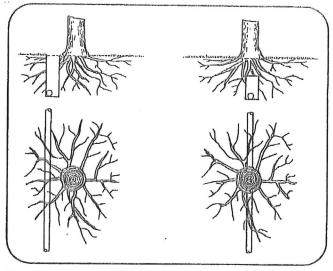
Excavation for utilities. Less damage is done to the root system if utilities are tunneled under a tree rother than across the roots.
